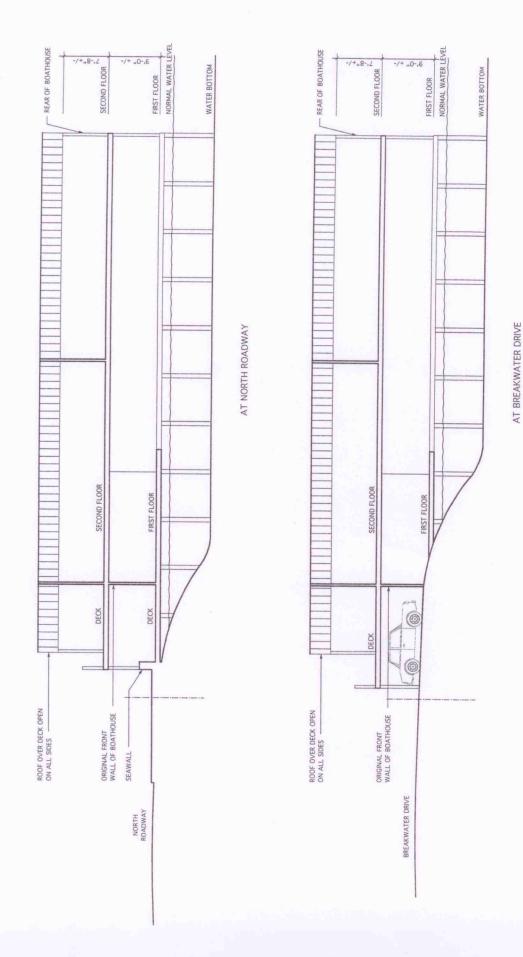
FIGURE B. SECOND FLOOR NOT ELEVATED & NO THIRD FLOOR
